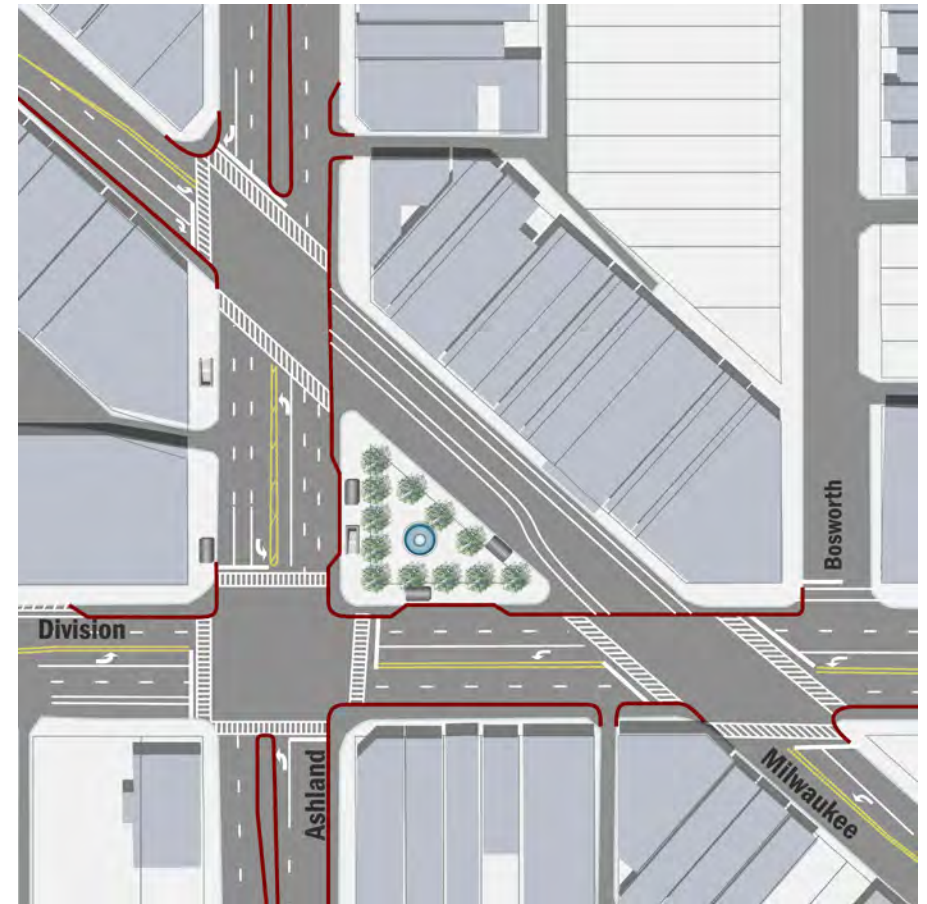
Polish Triangle Diagram of Proposed Changes to Sidewalk and Road Space
